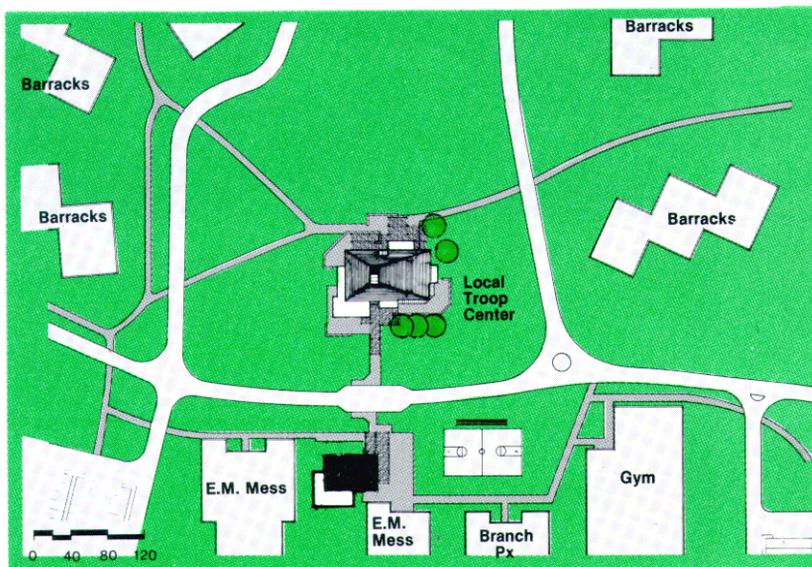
7 Fort Plains: Local Troop Center- Site Plan
